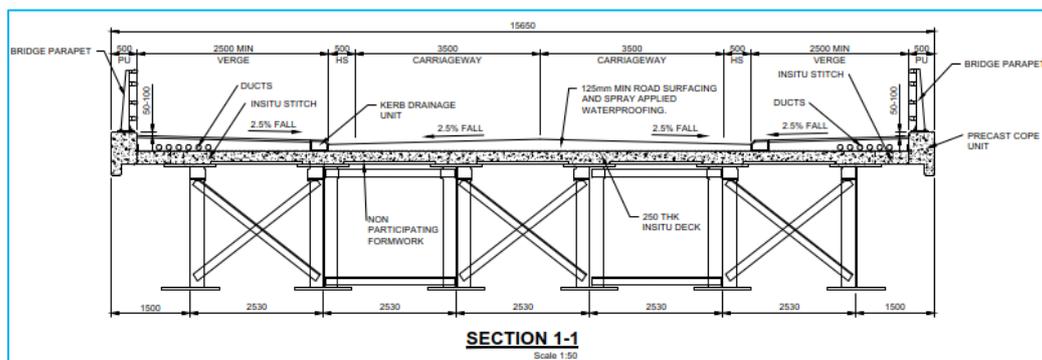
Proposed Bridge crossing of Abbert River – Cross-Section
